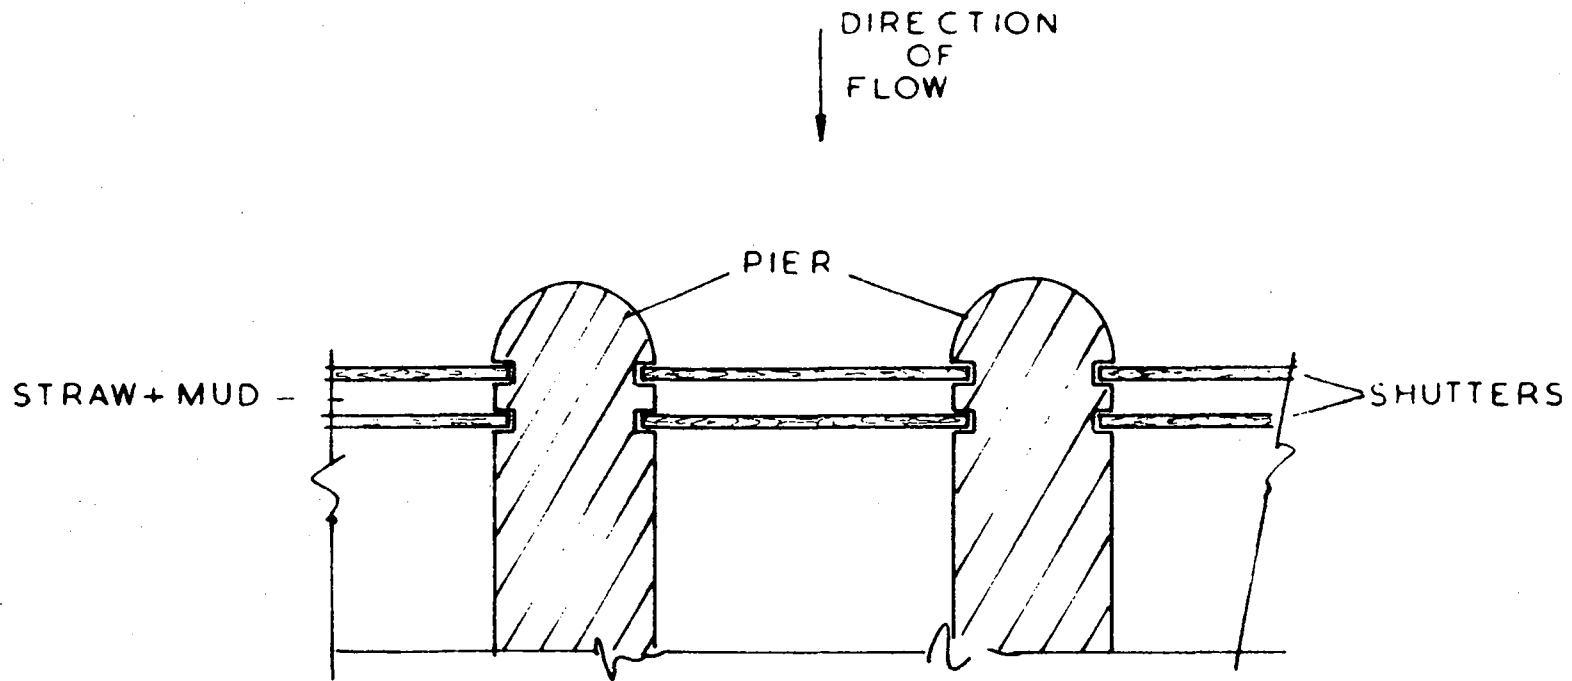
5 SECTIONAL PLAN OF PIERS AND SHUTTERS
